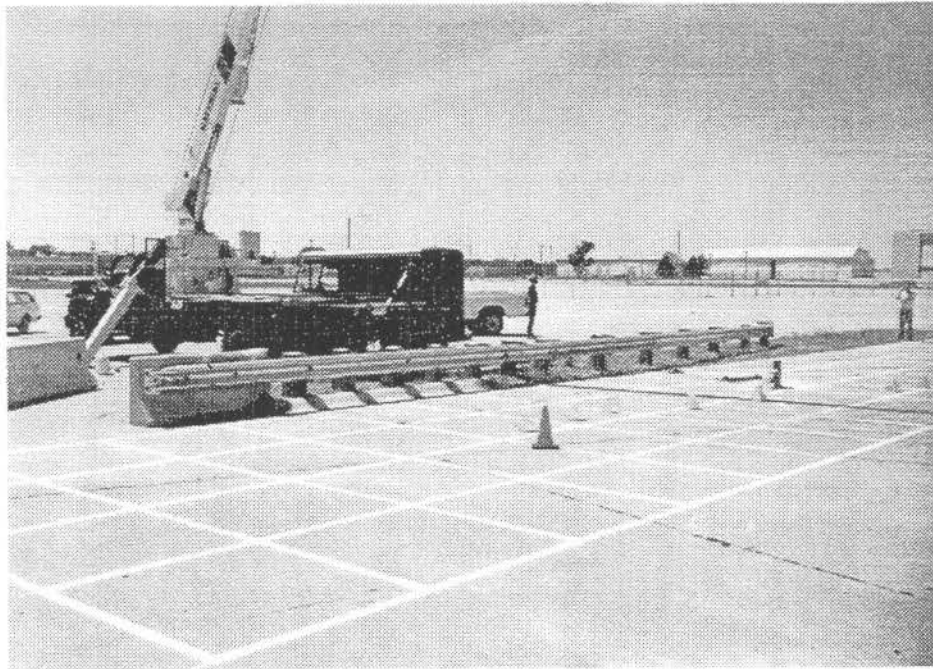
PHOTOGRAPHS OF W-BEAM APPROACH GUARDRAIL INSTALLATION.
